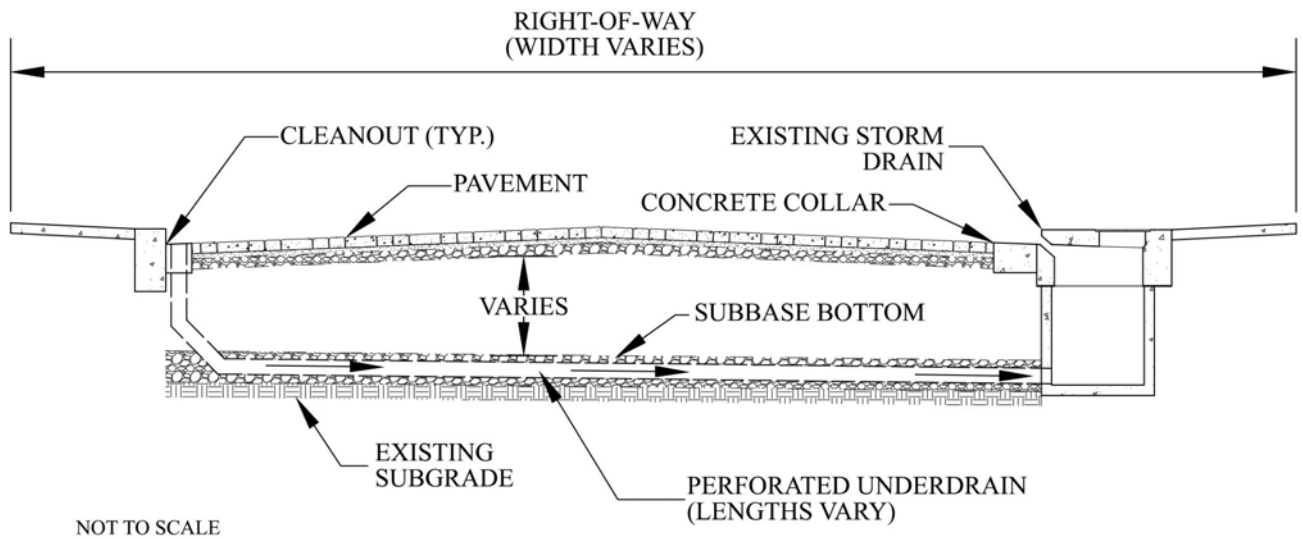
Typical Roadway Cross-Section with Perforated Underdrain Detail, *image by Author.
